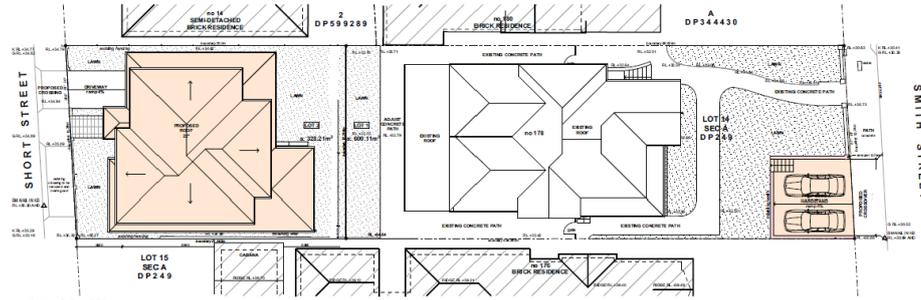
Site Context Plan that represents the previous subdivisions and the size of the proposed dwelling
